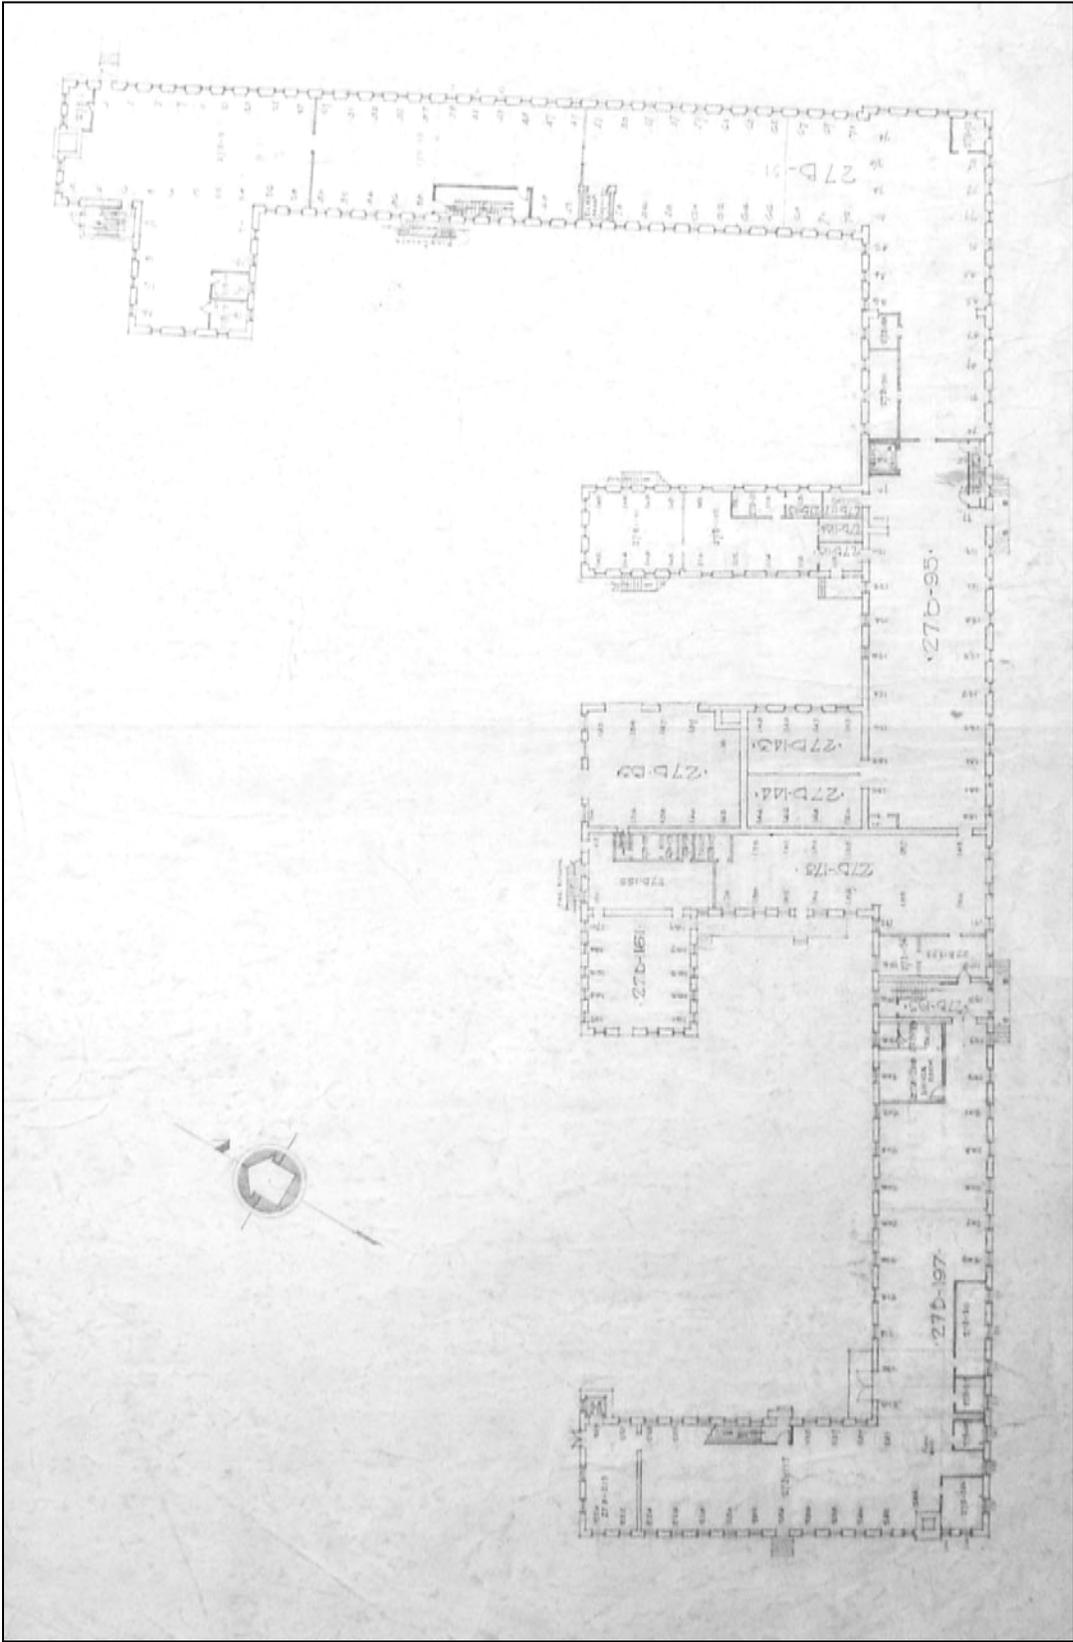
Building No. 27, Floor "B," Second Floor Plan, March 1, 1941 with revisions through 1955; not to scale. Note that Floor "B" was the first story above the basement (Floor "A") and is currently referred to as the first story.
